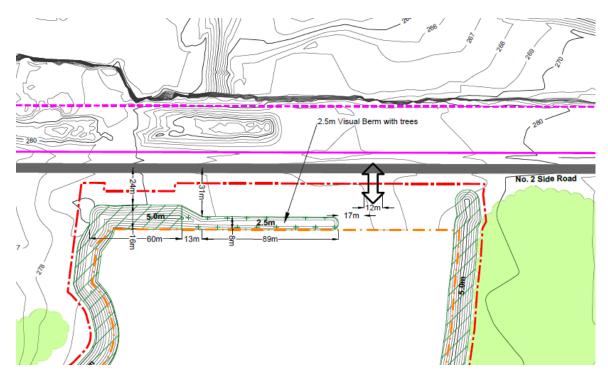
Location of proposed berms and crossing (MHBC)¹³.
